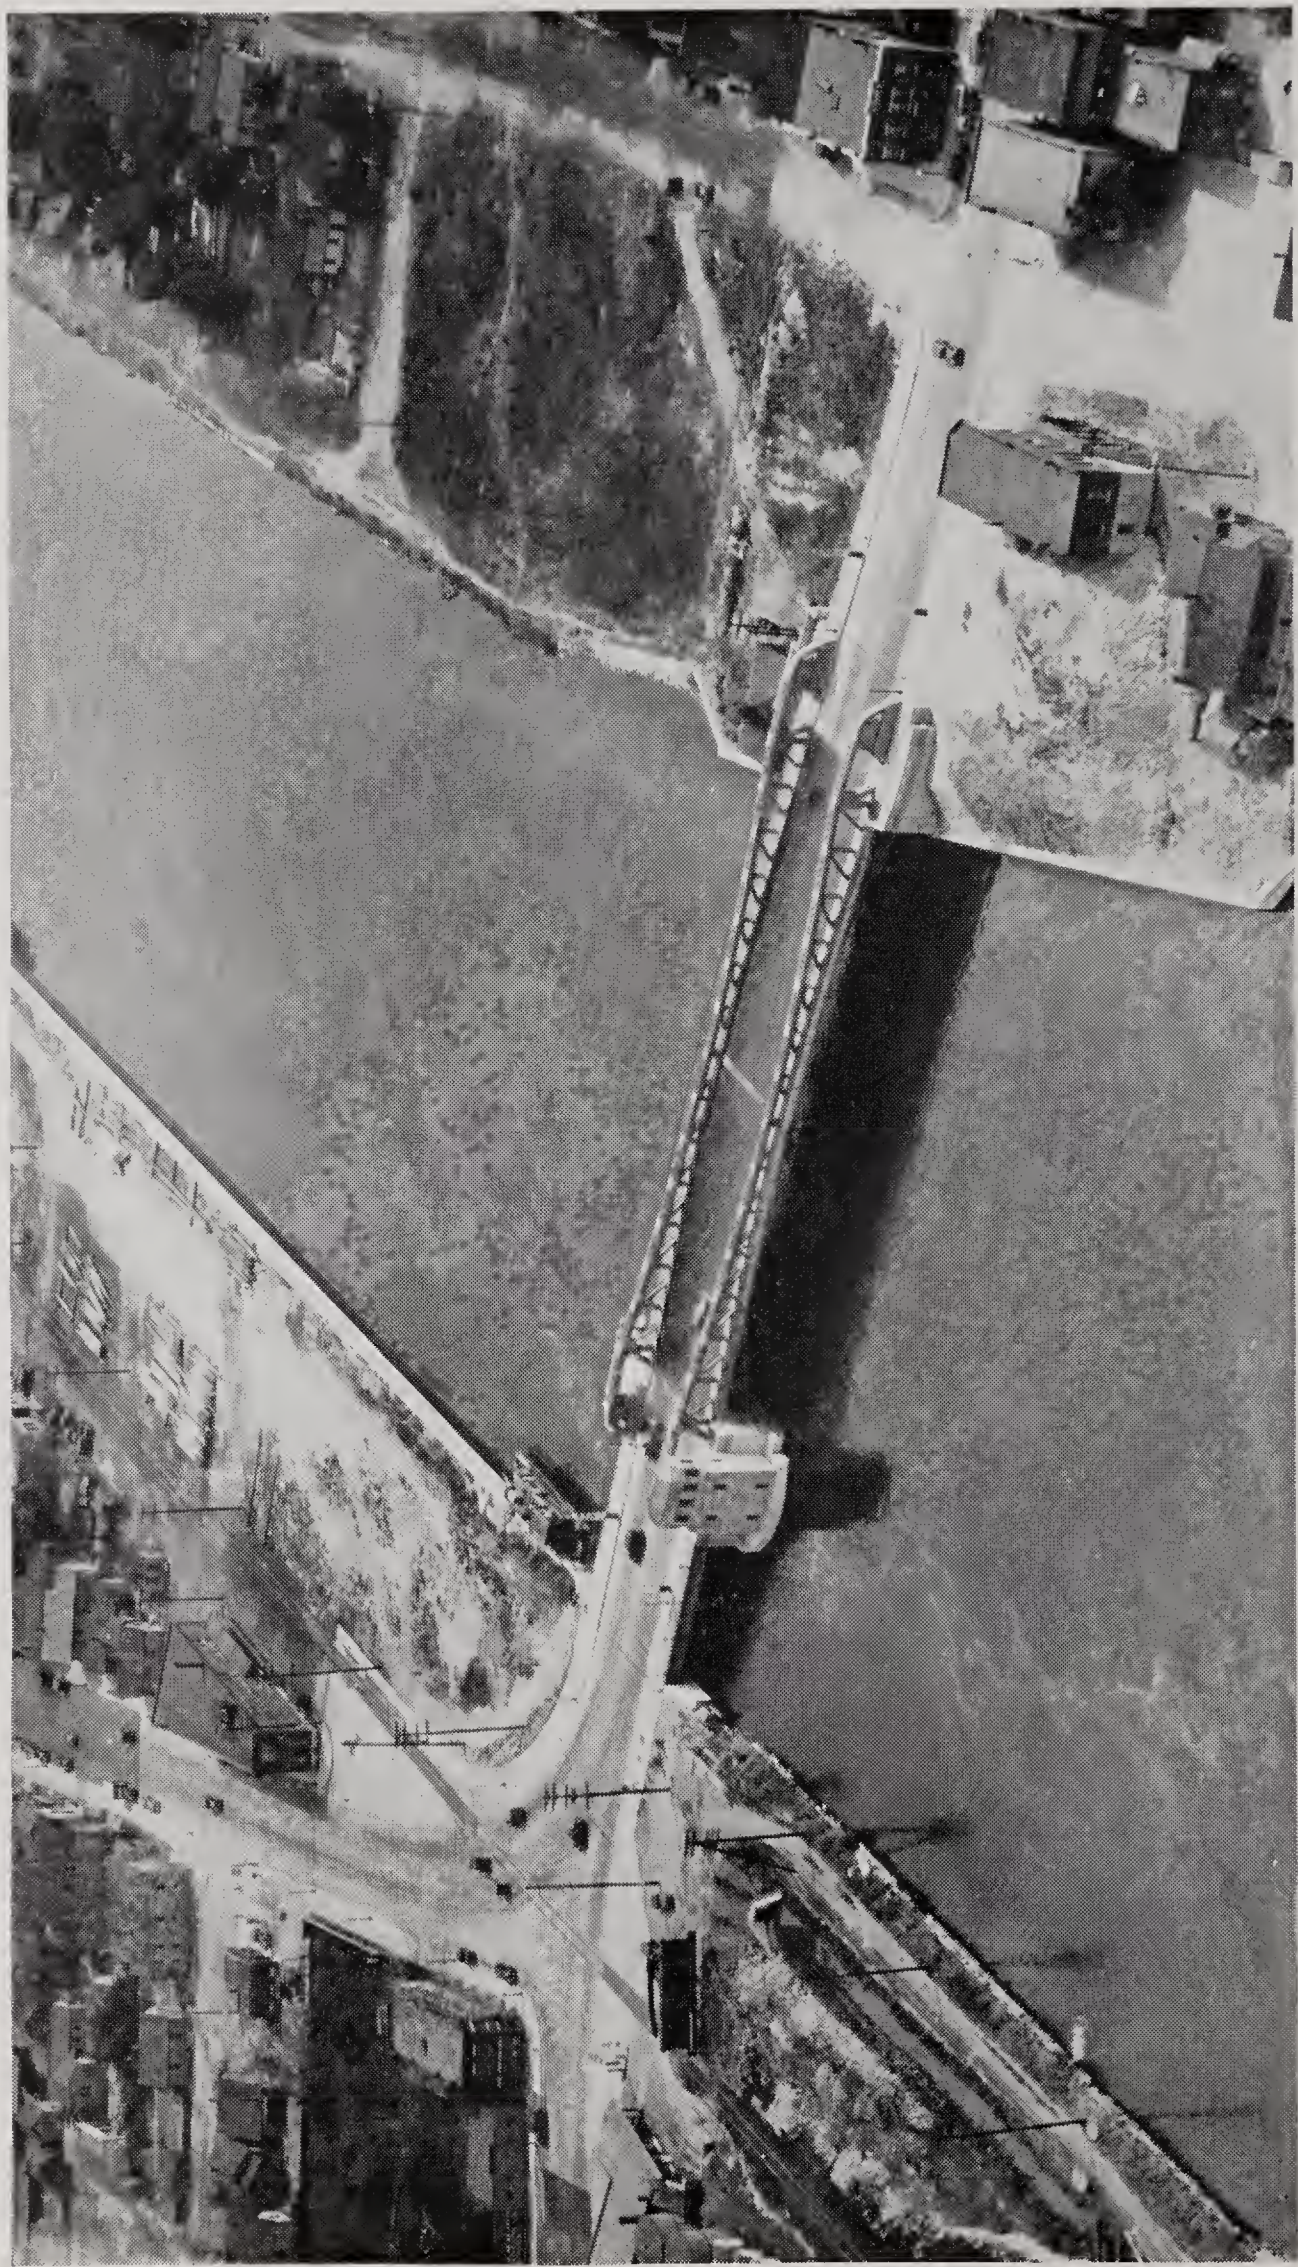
Aerial view of Ruby Street Bridge looking south at Joliet.
